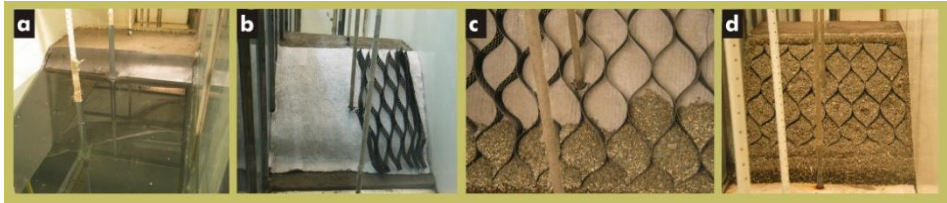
The upstream slope protected with the geomembrane – water level at 50 cm (a), placing drainage elements on the downstream slope (b, c, d)
